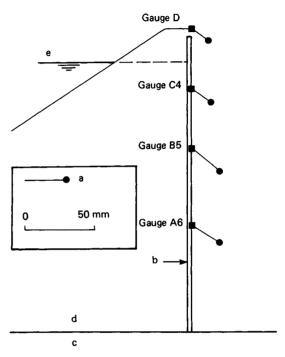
Downstream movements of the core on impounding. a, Observed movements; b, asphaltic concrete core; c, foundation; d, gravel fill; e, reservoir water level
